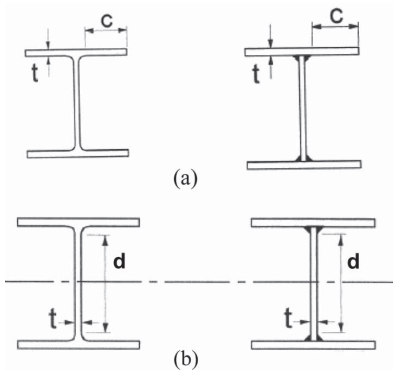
Definition of geometrical dimensions, (a) for hot rolled sections, (b) built-up sections.
